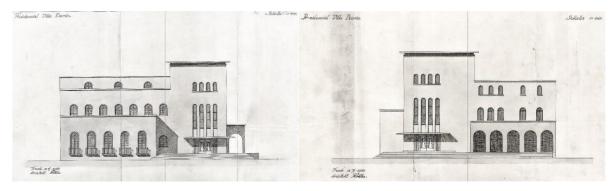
South and East Façade of Kohler's Proposal (Source: AQTN).
